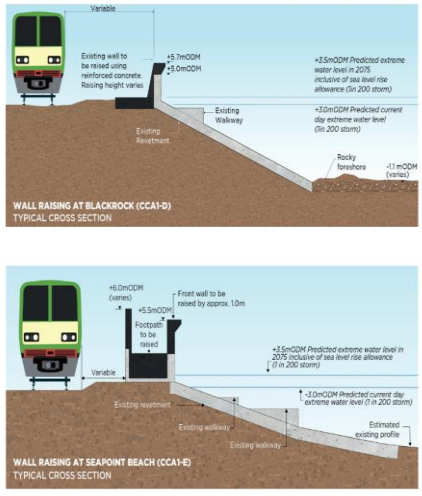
CCAI Typical cross sections showing wall raising (thick) and raised revetments, walls and walkways at Seapoint (bottom)
